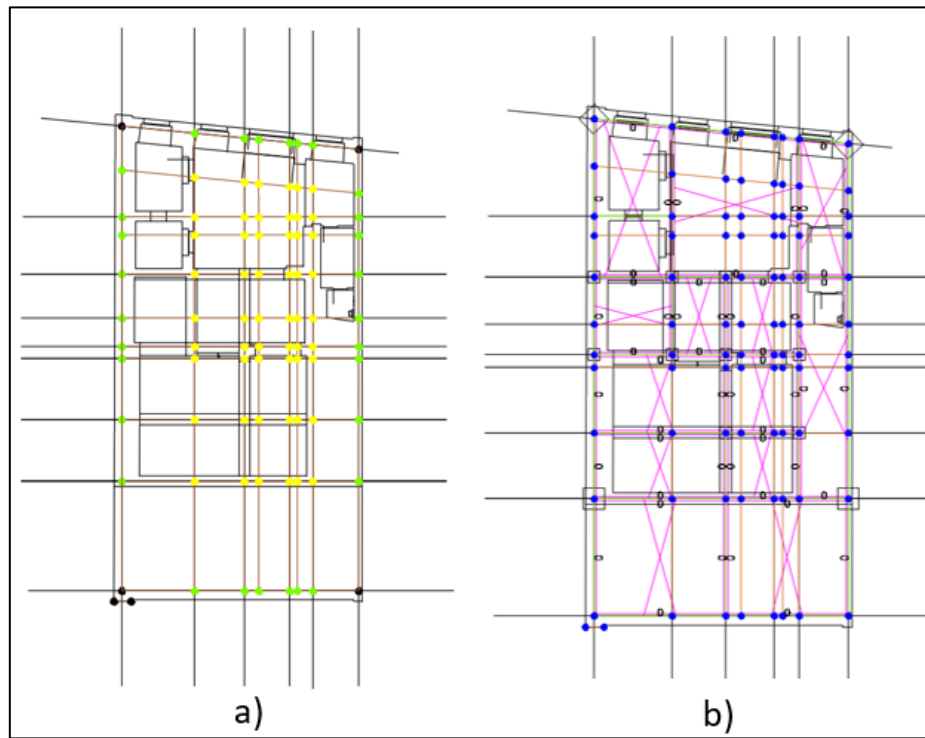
a) Floor plan previously prepared with grid lines in representation of the structural walls, b) floor plan in Tremuri with defined structural elements
